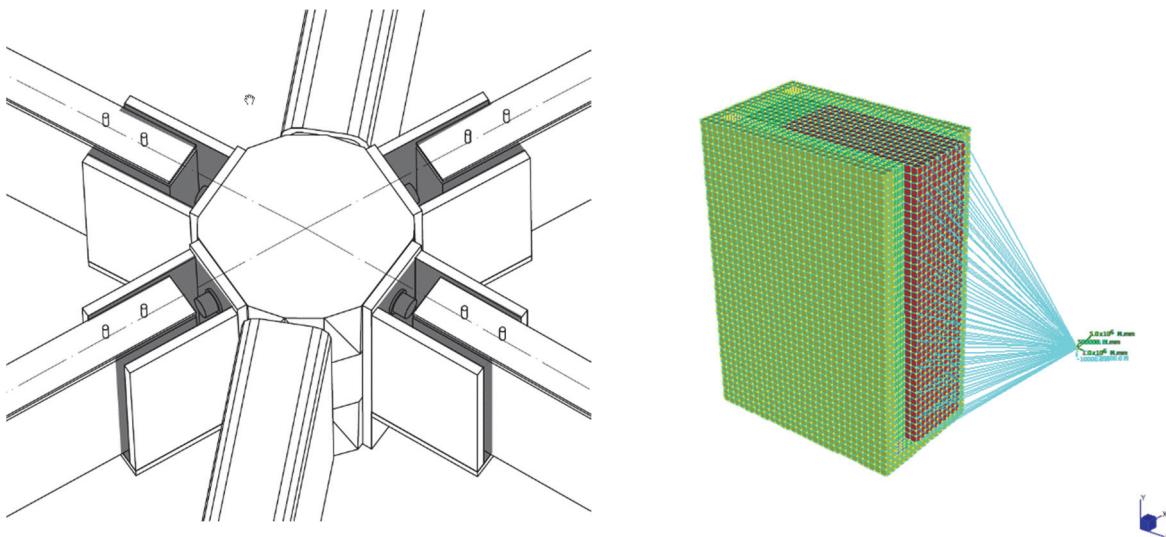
Typical joint detail (left), Brick Model of the Silicone Connections (Right)
